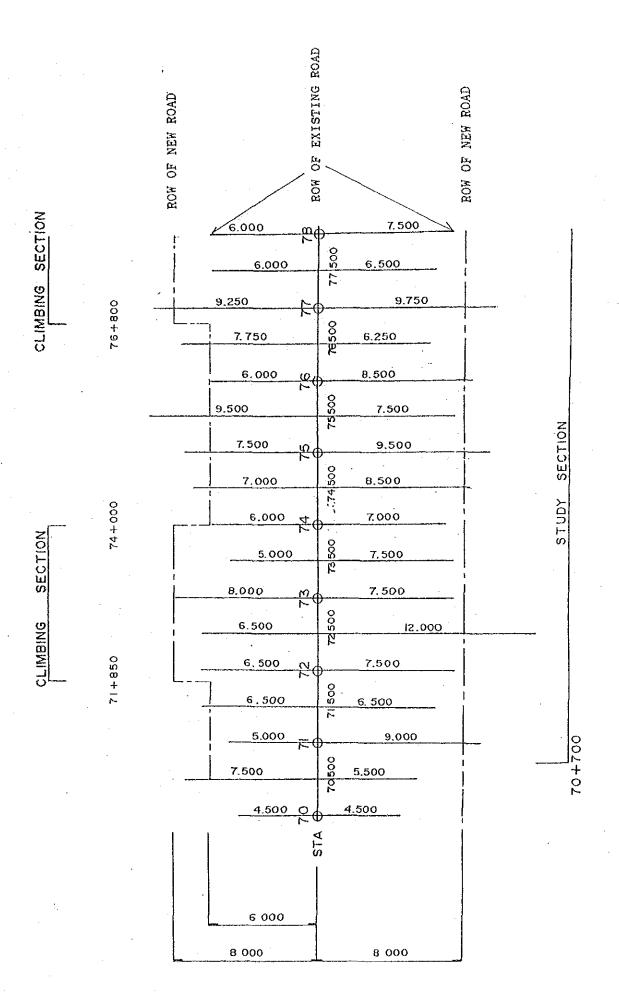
A Standard Section and Climbing Section (A)
